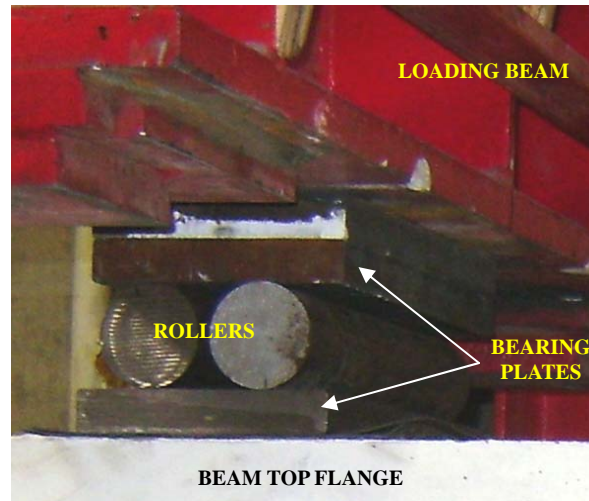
Steel Roller-Bearing Plate Assembly used to Load Beams
